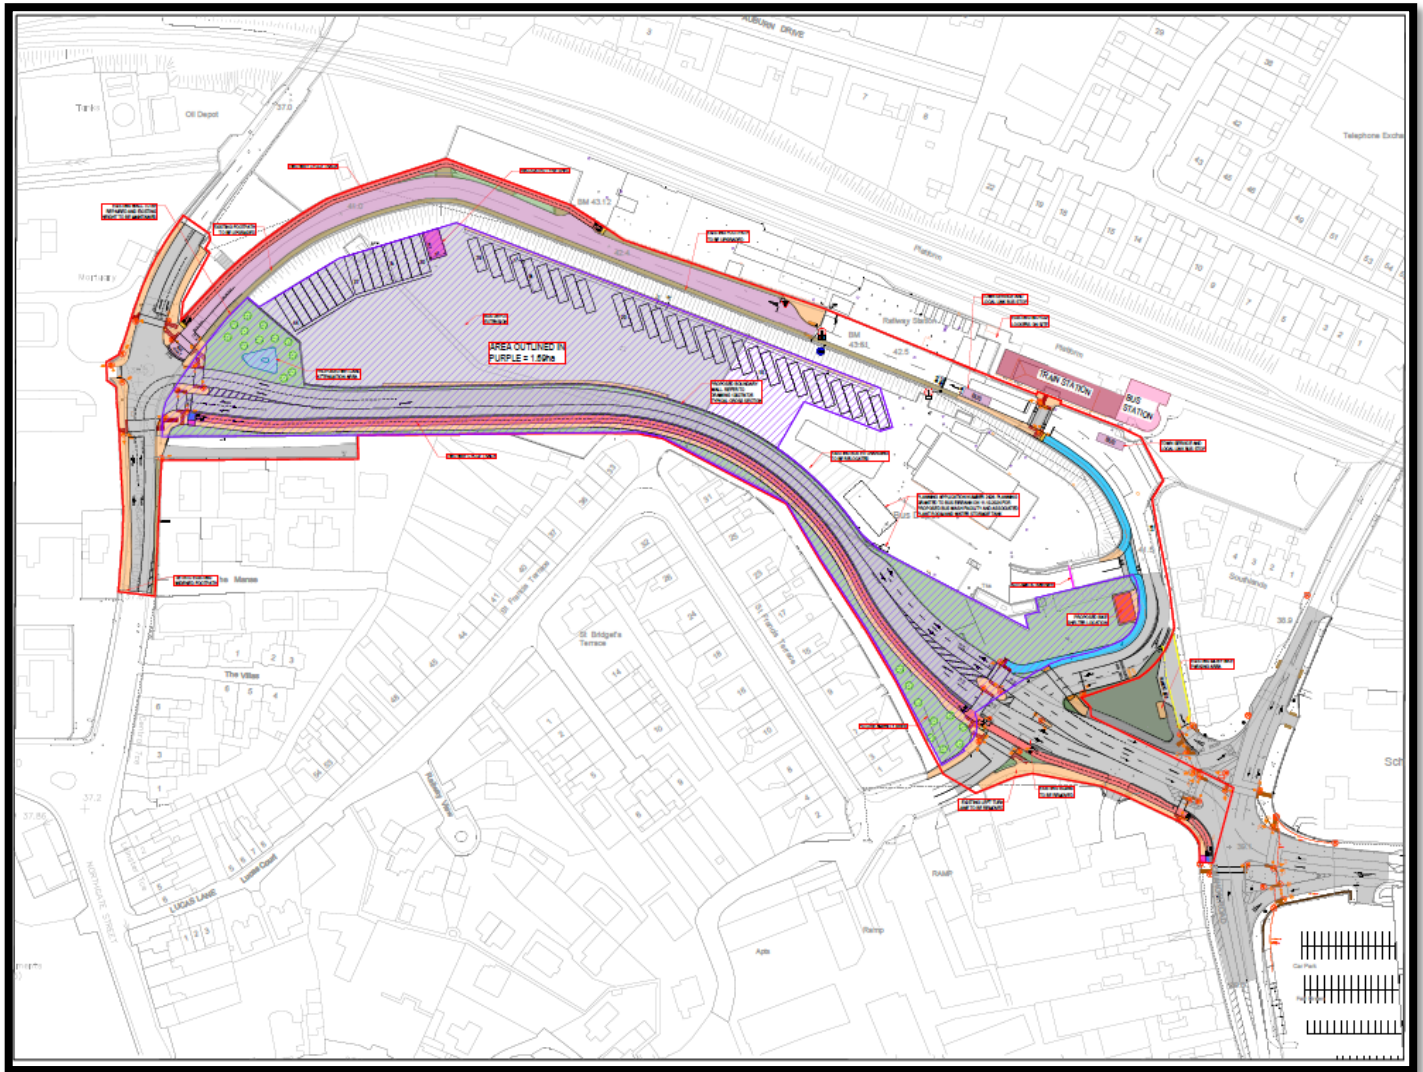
Extract from Site Layout Plan indicating Net area of proposed works (1.69ha) shaded purple
